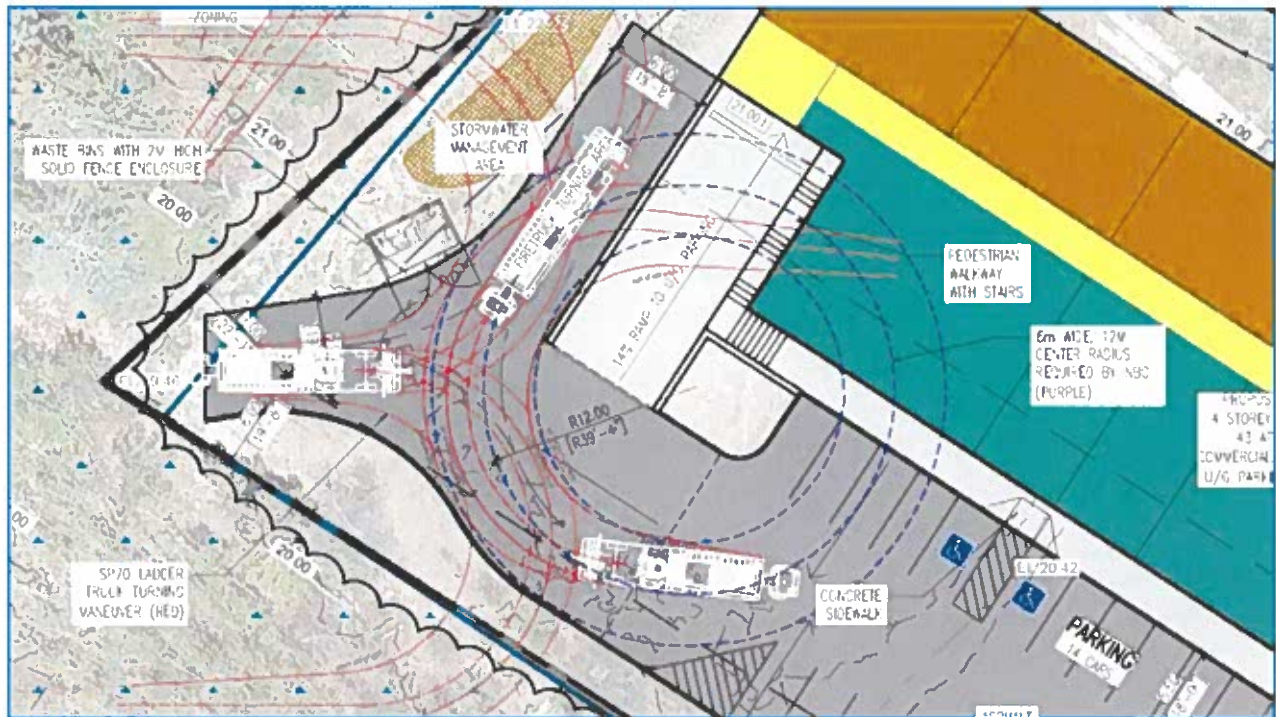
Revised Site plan with Turning Area for Fire Trucks
